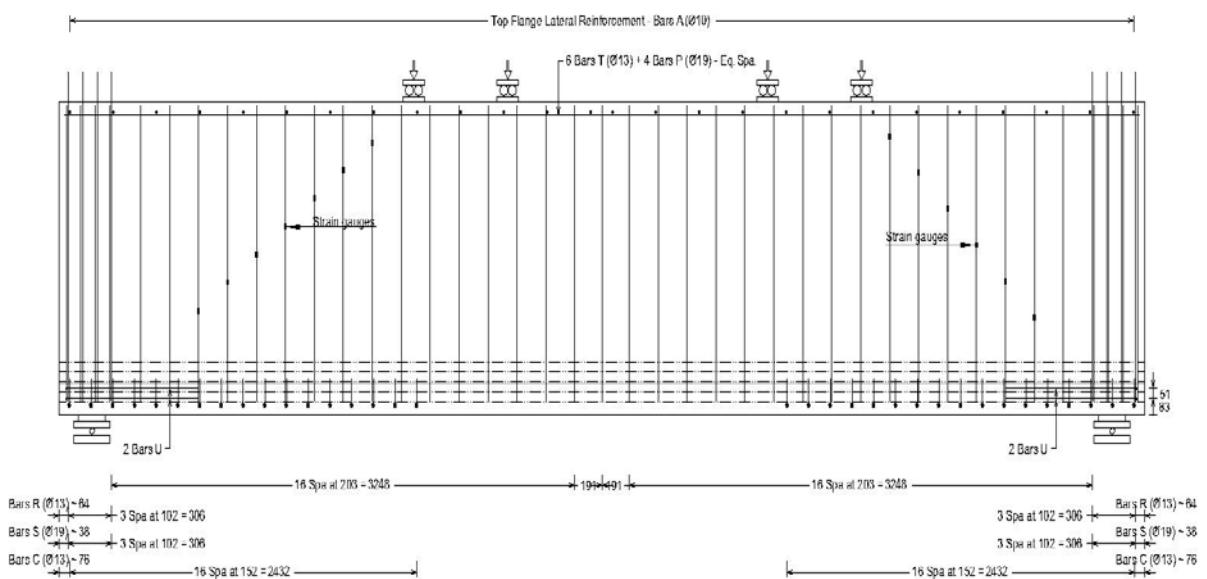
Concrete Dimensions and Reinforcement Details for Girder E2 (Labib 2012)
